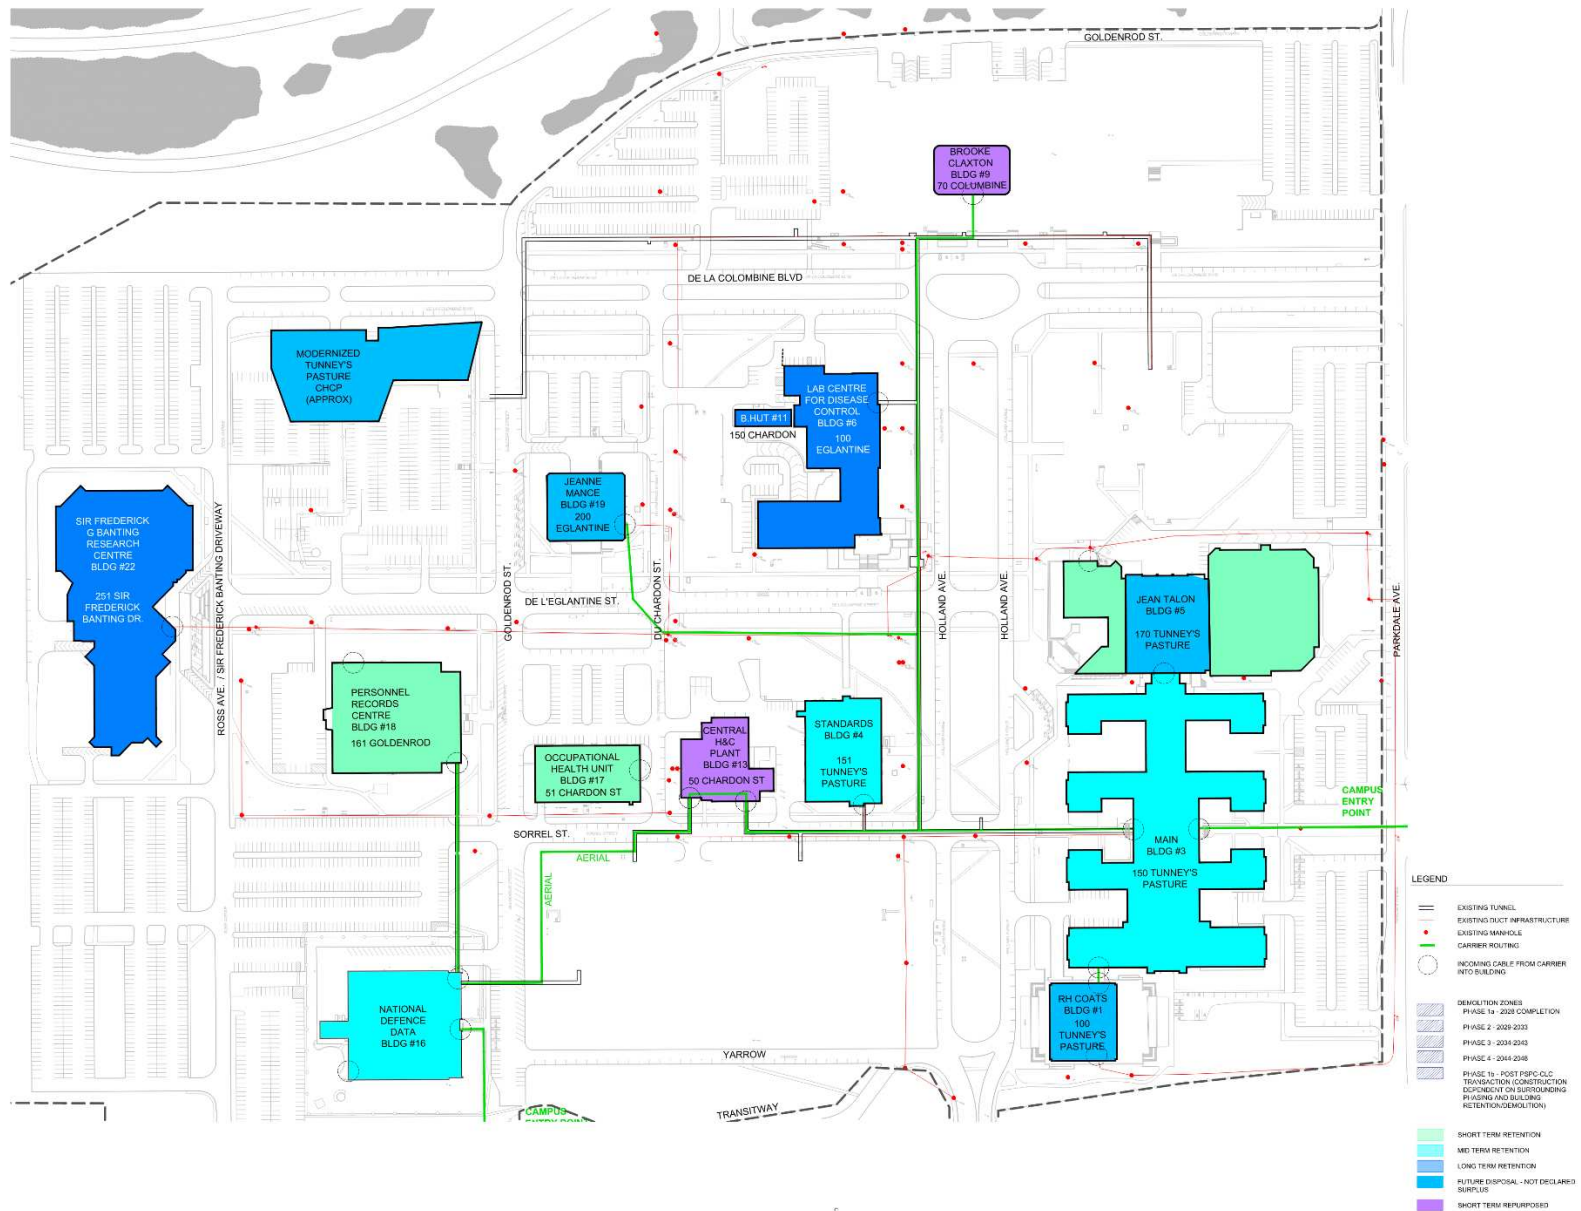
Existing Zayo Fibre Routing at Tunney's Pasture
